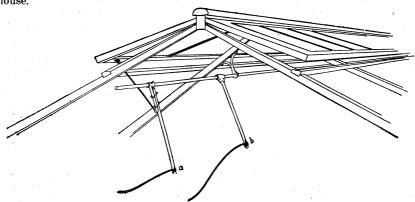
Methods of attaching rod and cord (a, b) to ventilator shaft of greenhouse so that the ventilators can be opened from the outside after fumigation. (Sasscer and Borden.)
